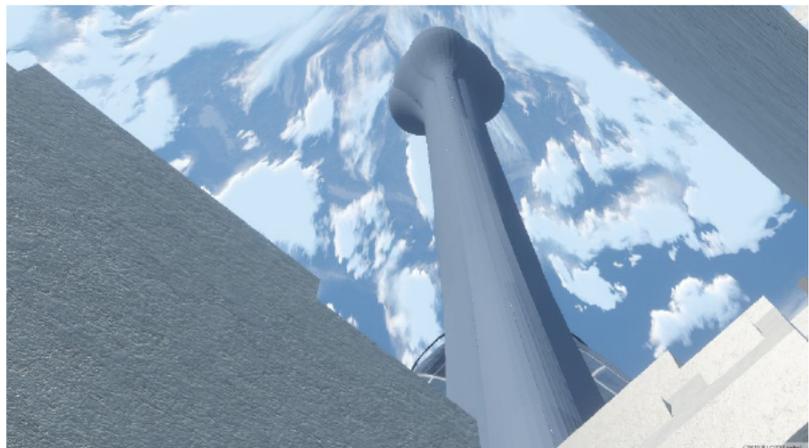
Rendered View number 4 from within the Annexe Building (Annexe roof structure not shown)
